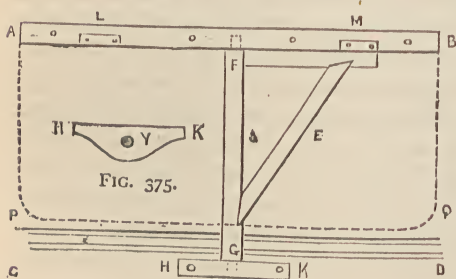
ELEVATION OF RAIL AND BRACKET OF BRACKET SHELF.
